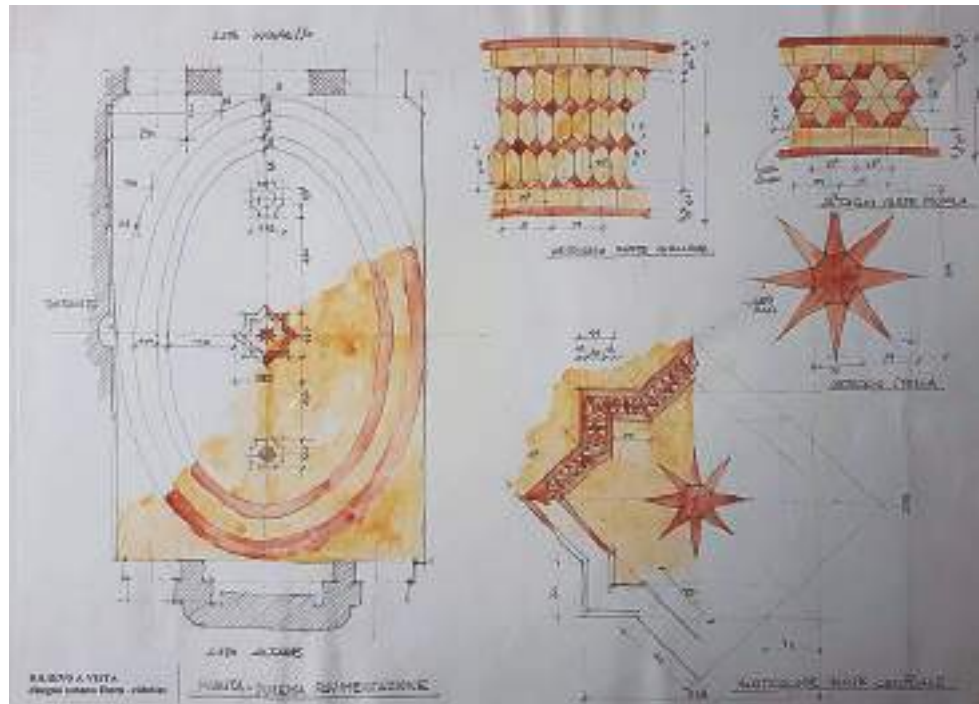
Details of the floor, watercolour drawings. Drawing by E. C.
